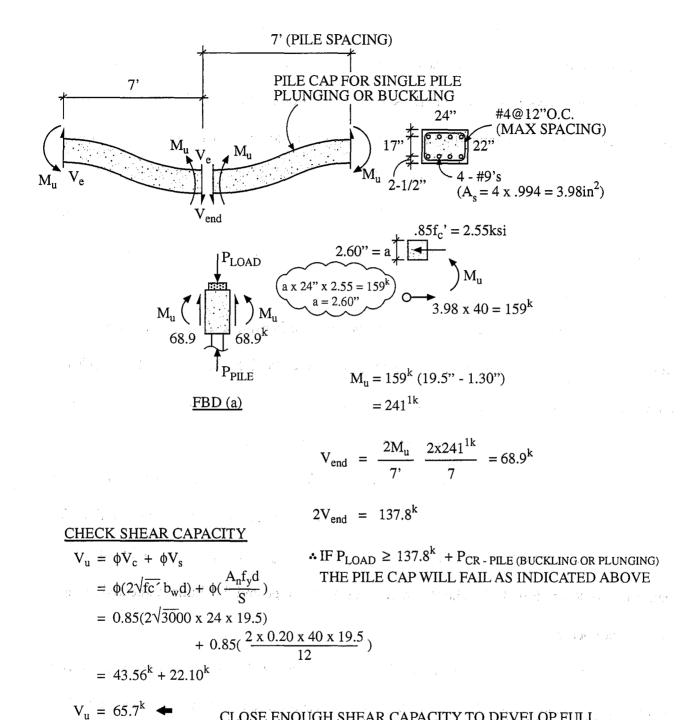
Examination of Pile Cap Flexural Failure for Case of Well Reinforced Cap.
